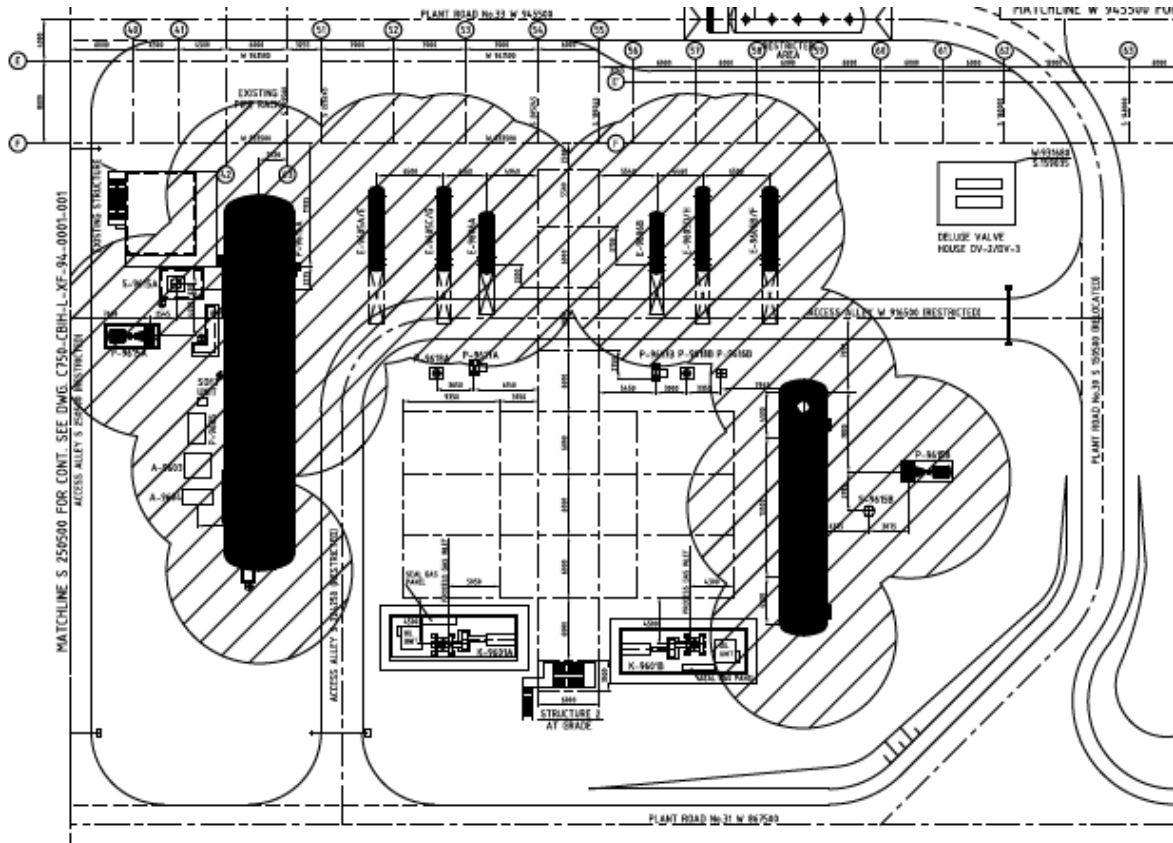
Fire proofing layout (passive fire protection) around U-9600 (2)
